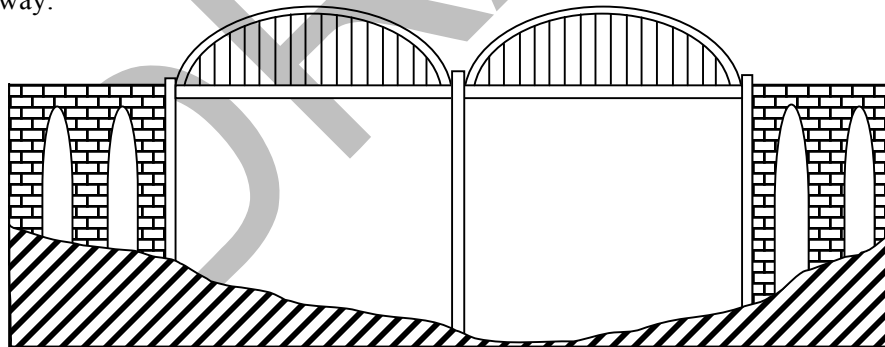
A bowstring girder (or tied arch). It may look like an arch bridge but the abutments carry no lateral thrust, only vertical forces.
